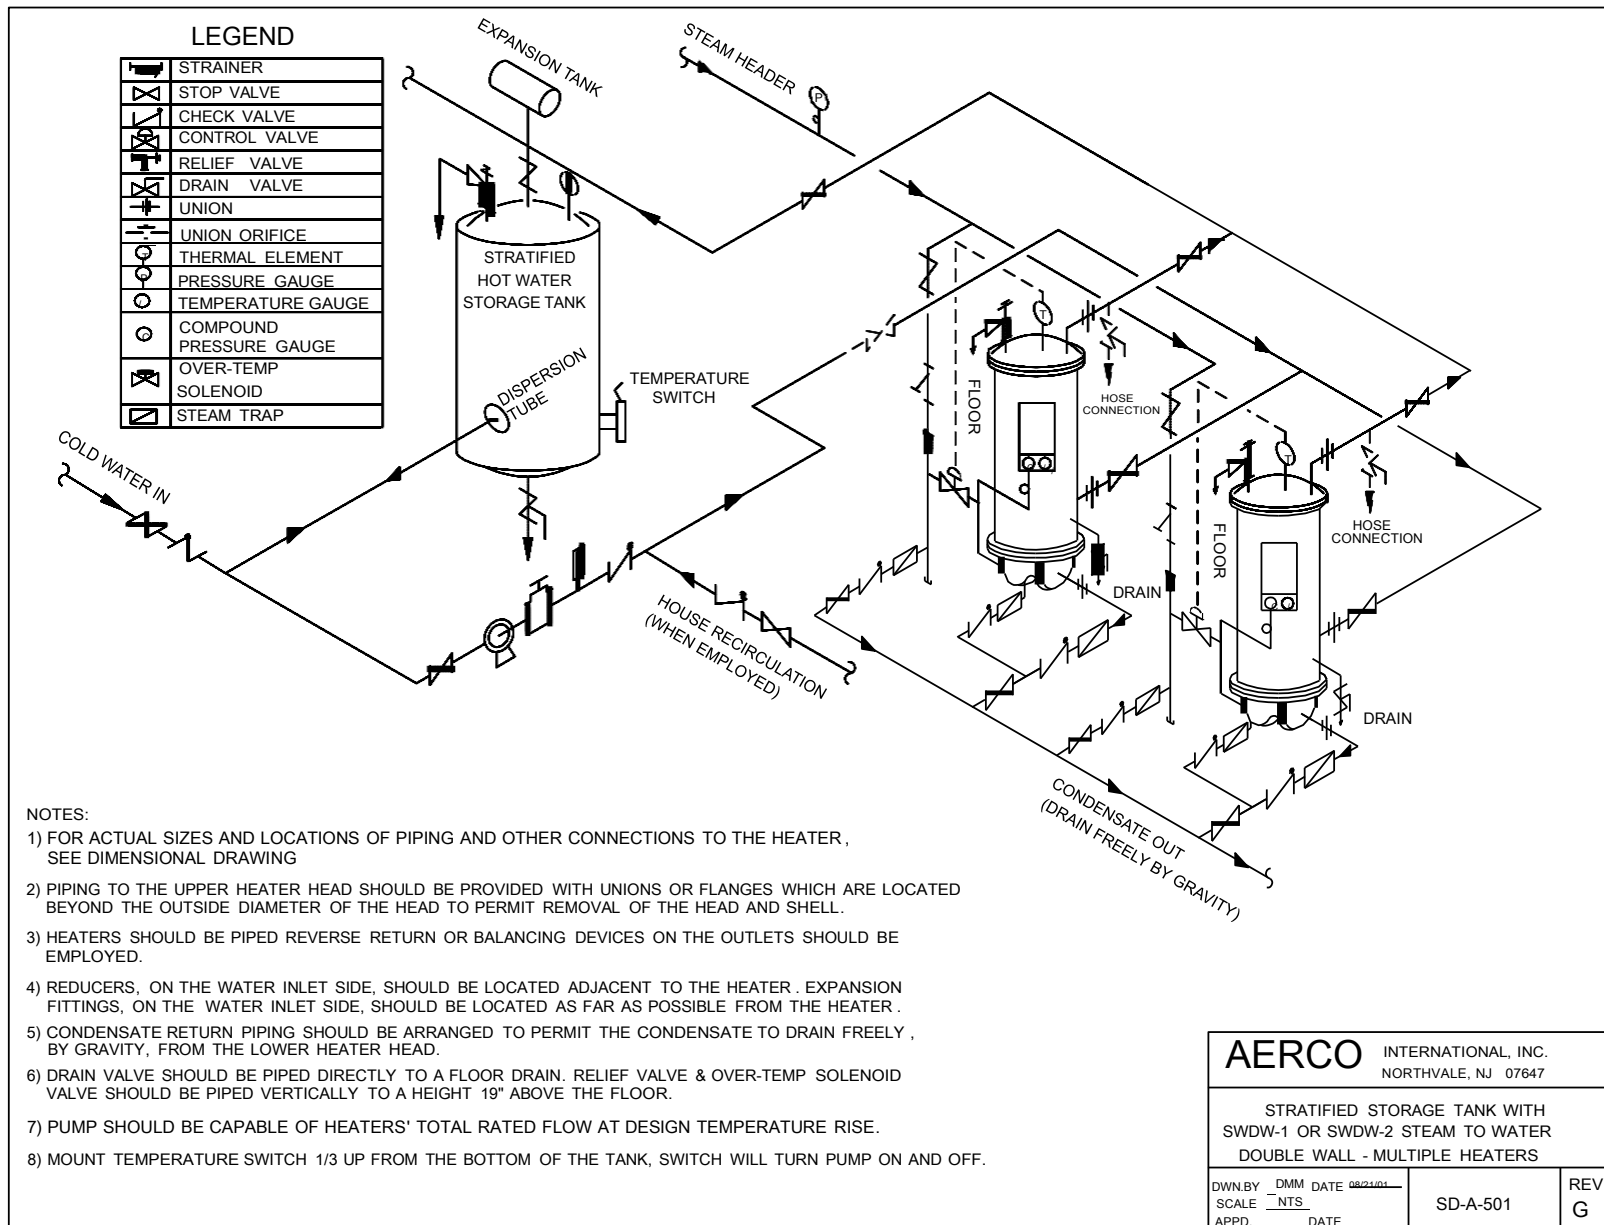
Piping Connection for Multiple Heat Exchangers with a Stratified Storage Tank
